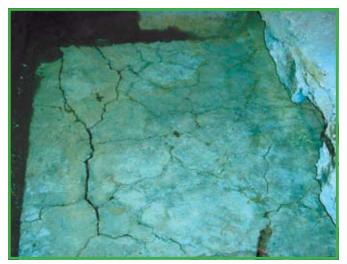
Detail of crack on the left side of another block, with an opening of more than 30mm
